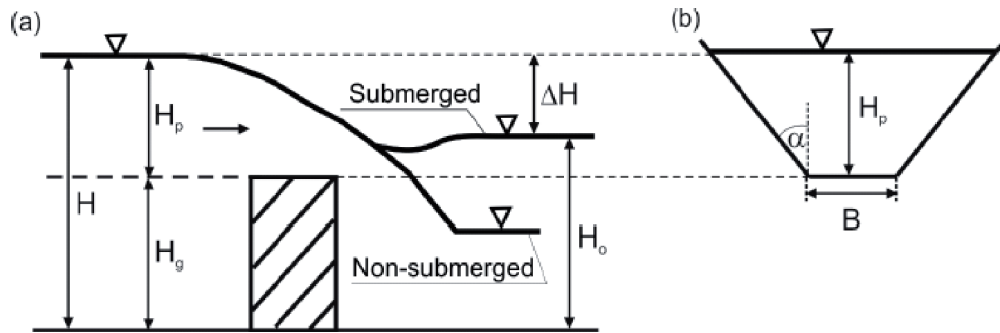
Hydraulic scheme and cross-section of a trapezoidal weir [4]. (a) Hydraulic scheme of weir, and (b) Cross-section of weir.
